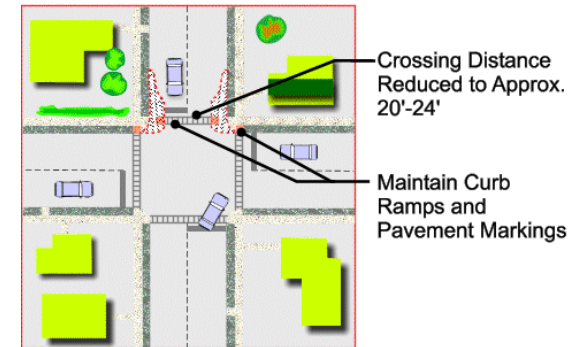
An example of bulb-out placement to reduce curb radii and shorten travel distance for pedestrians crossing at an intersection.
